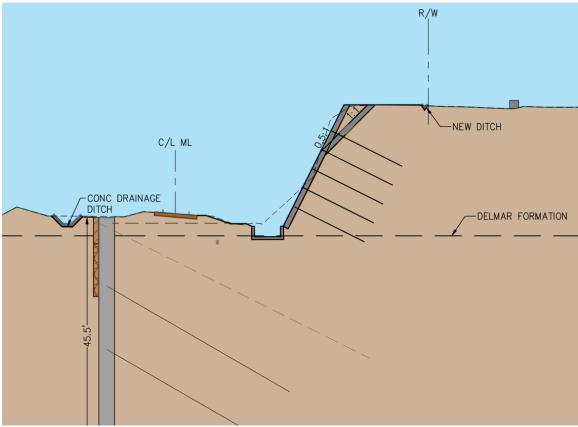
Drainage Area 2 Section: Sta 1542+00 – Sta 1545+00
